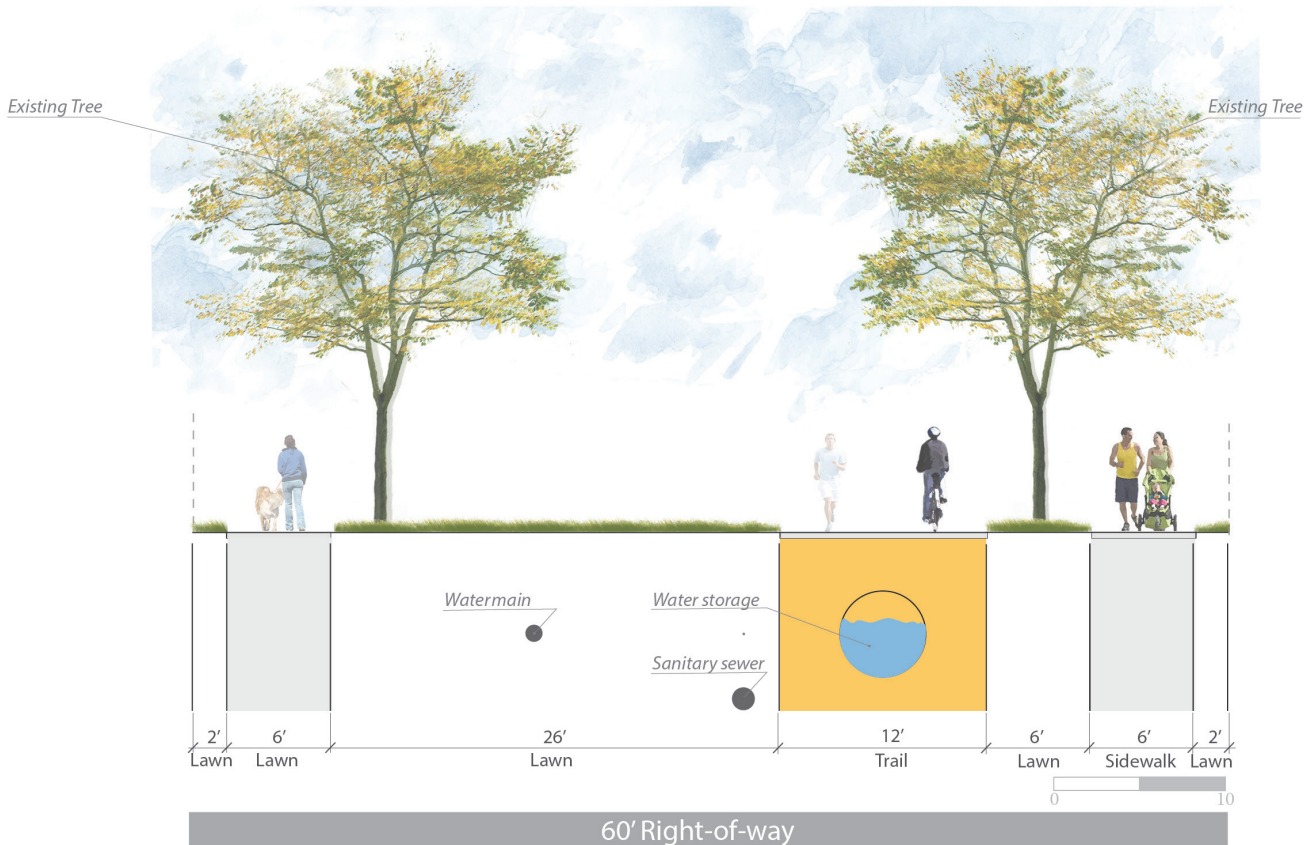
LARGE PIPE STORAGE (OPTION B): SECTION
